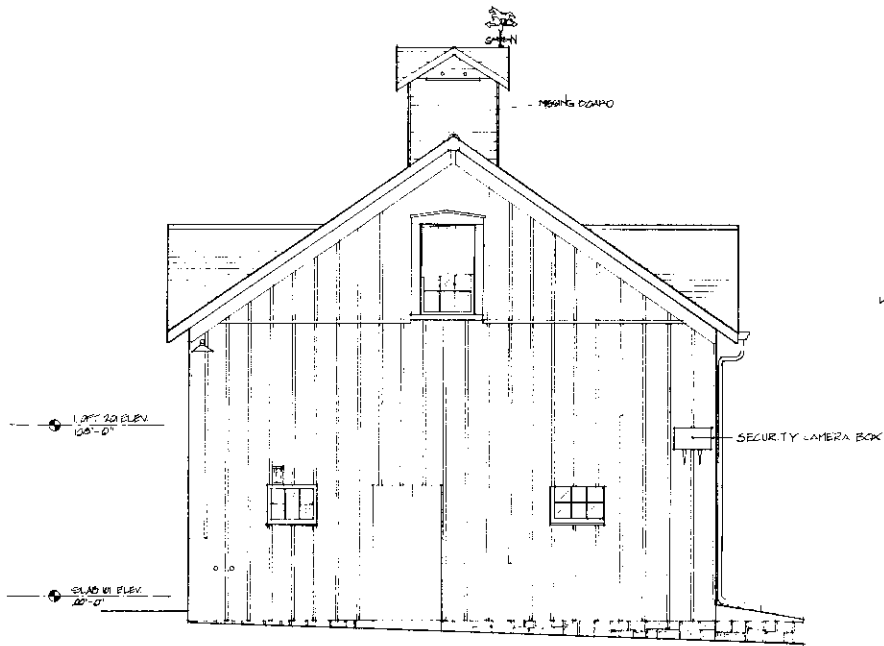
Sill Beam at Post #17, Truman Carriage House. December 1985. West elevation. Credit: National Park Service, Midwest Region
